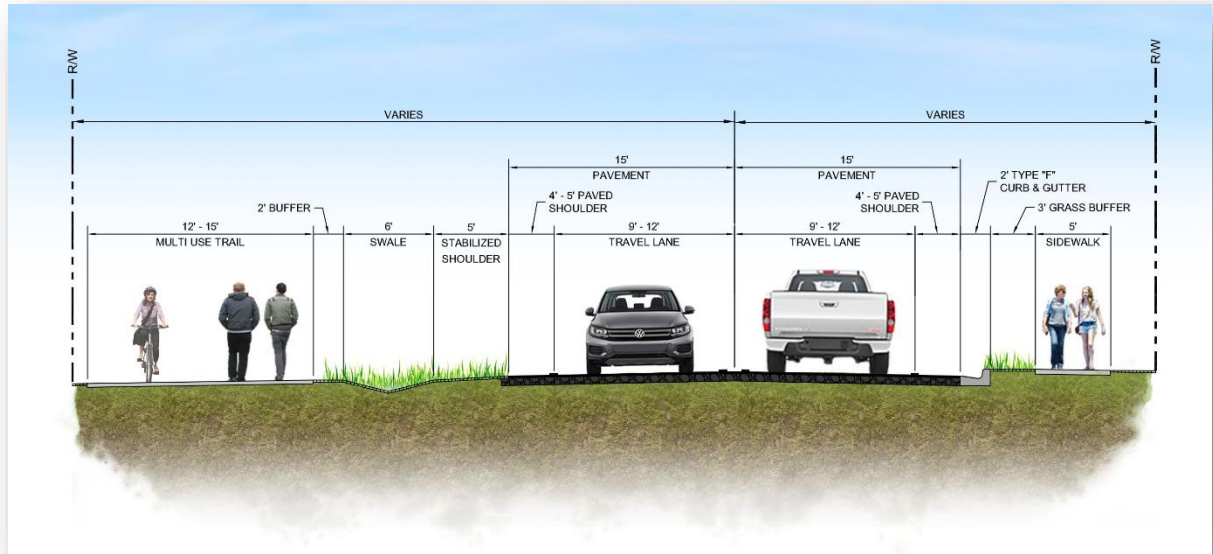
Divided Multi-Lane Road with Multi-Use Trail and Sidewalk
